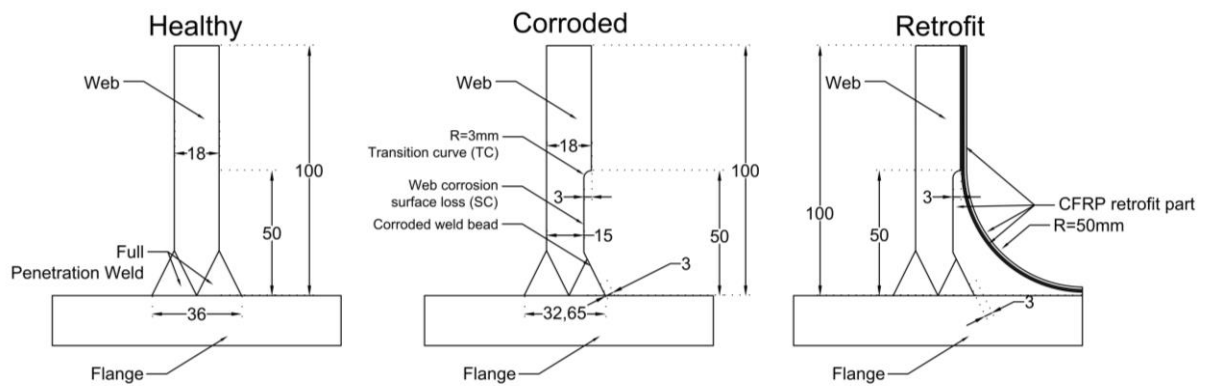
Assumed state condition healthy-corroded-retrofit (HCR) of girder ends modeling. (Unit: mm)
